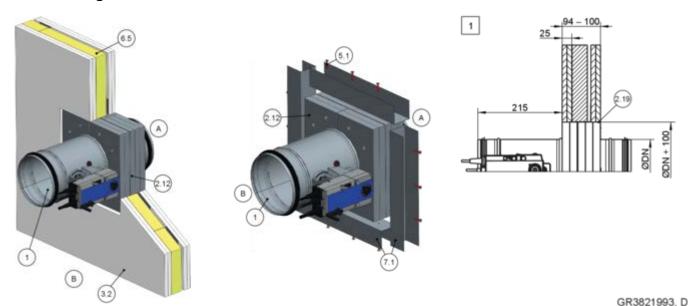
Dry mortarless installation in lightweight partition wall with installation kit GL2 during wall construction
